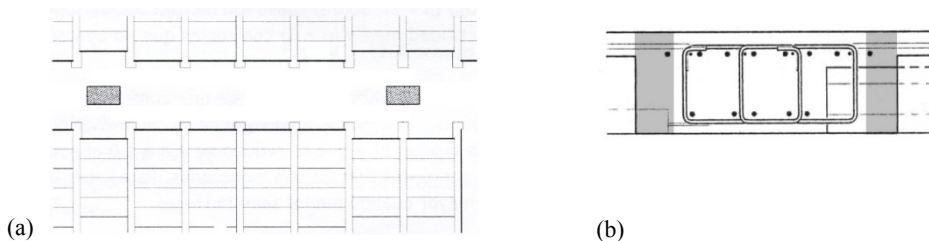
Typical distribution of elements in a one-way joist slab (a) and detail of joist-wide beam connection (b, from De Andrés and CSCAE, 2009; in grey, gross section concrete outside the beam web)
